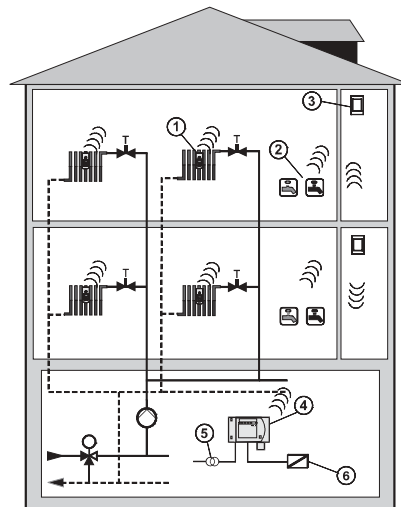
Application example: apartment house (Source: Siemens Landis & Staefa)
